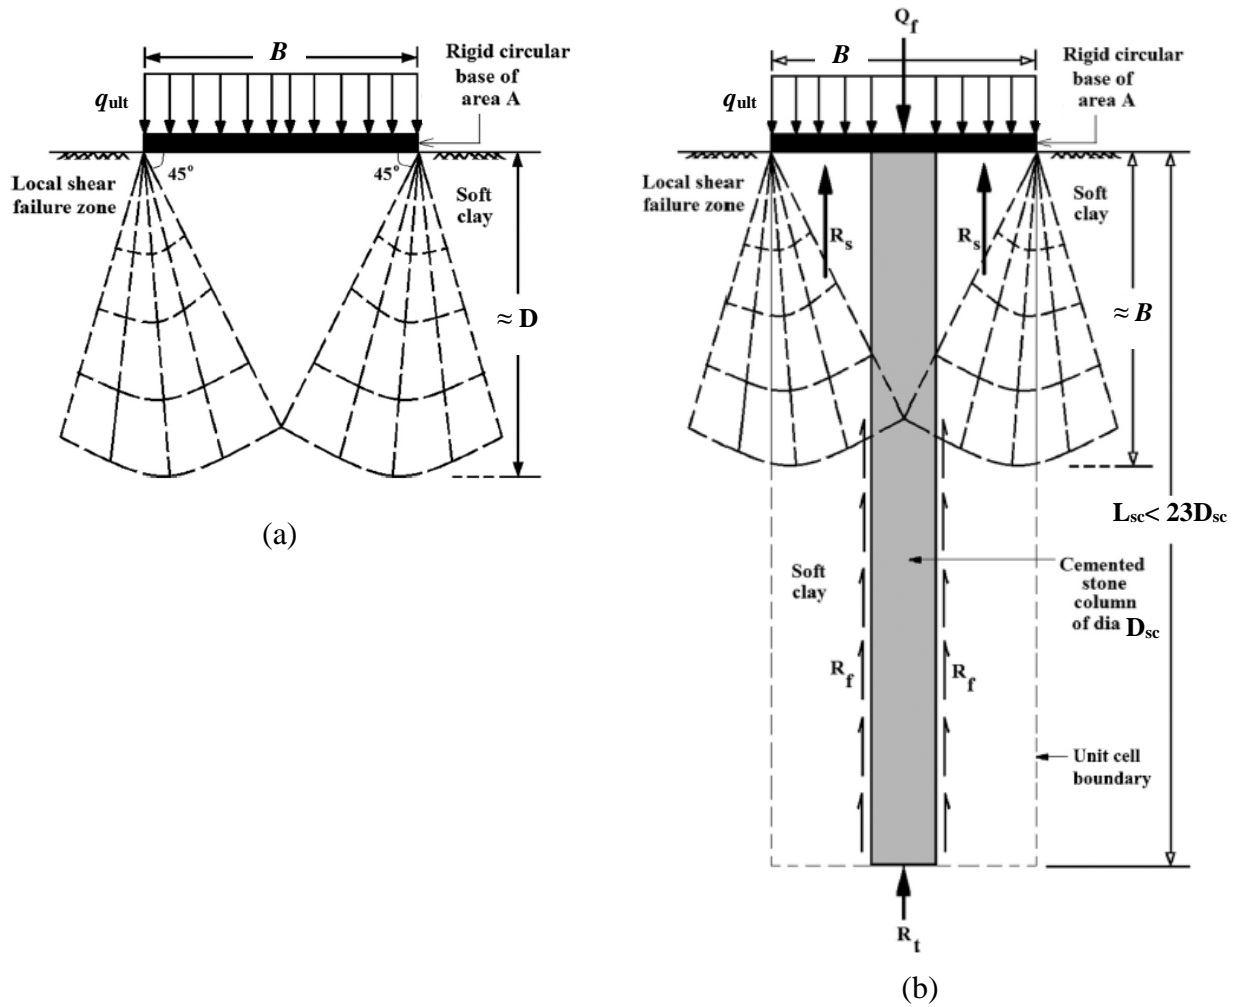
Failure mechanism of a single cemented stone column. (a) untreated soft clay failure mode, and (b) single cemented stone column failure mode (after Golait and Padade 2016).
